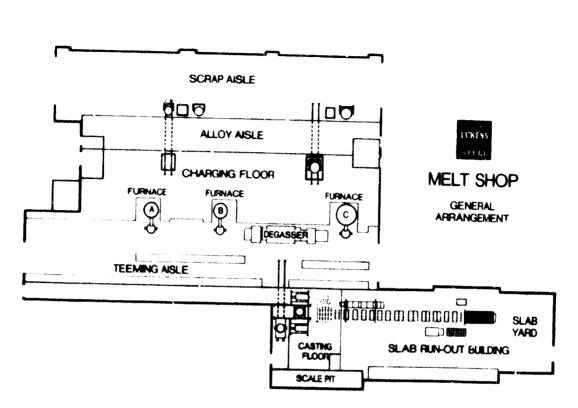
Simplified Plan View of Melt Shop and Continuous Casting
